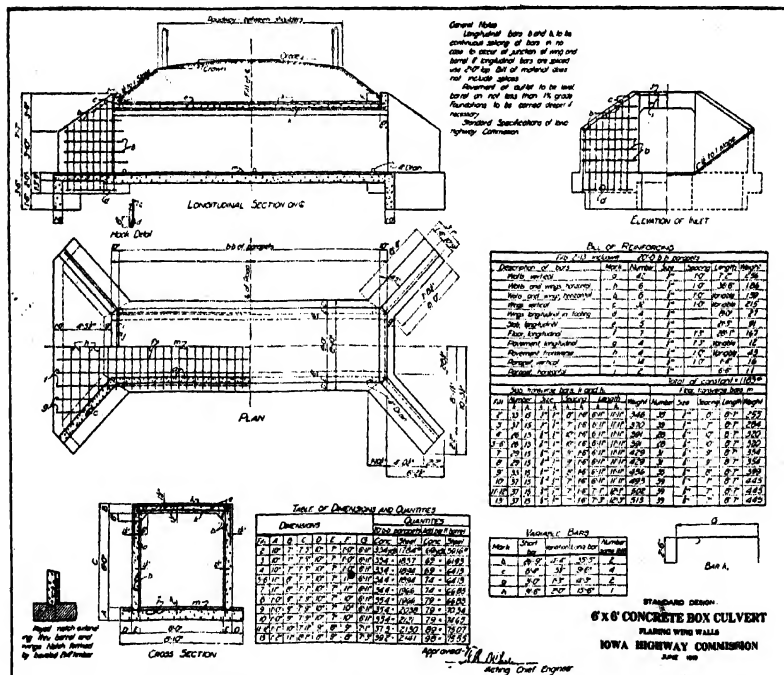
Details of standard reinforced concrete box culvert of the Iowa Highway Commission.
